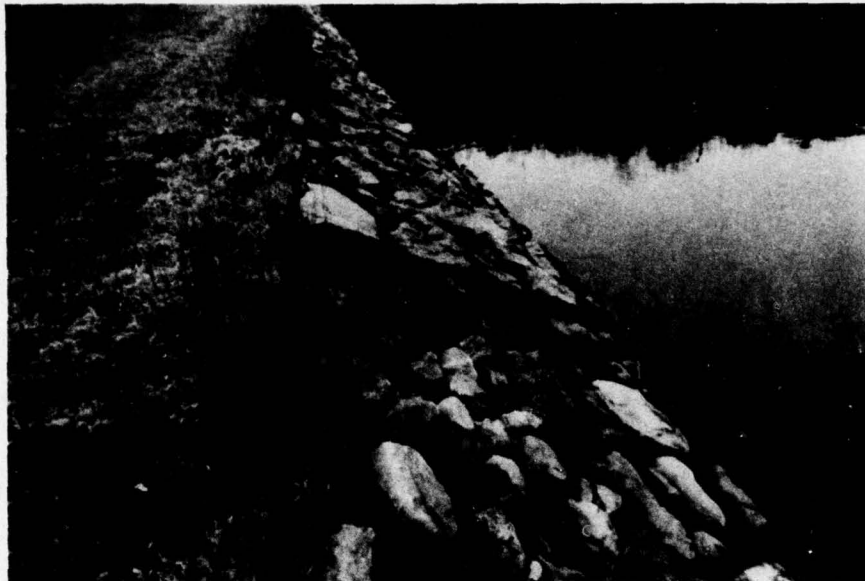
Rock riprap extends to the crest of the embankment. (12-2-78)
